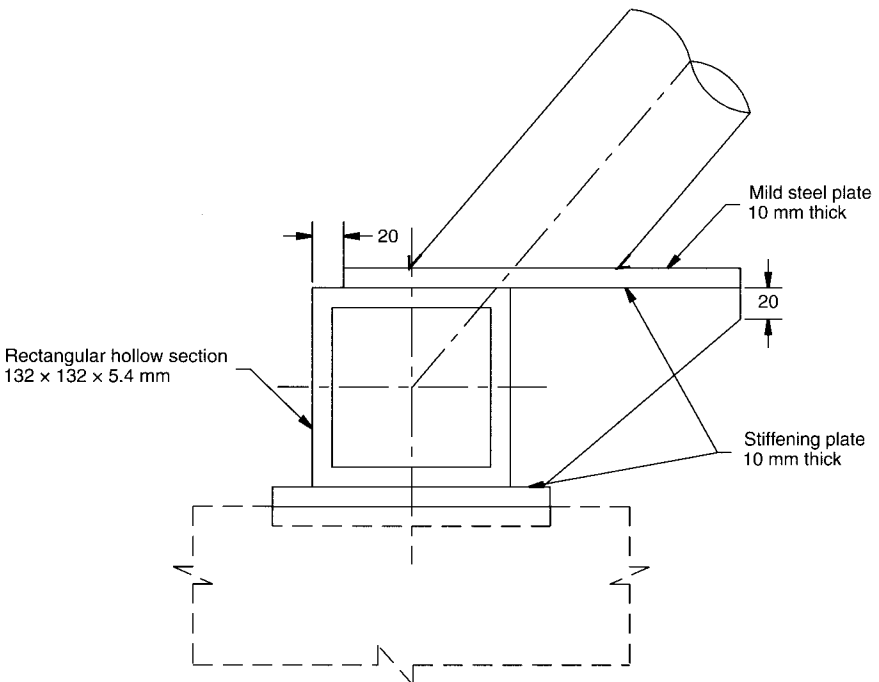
Detail of the connection of the edge beam and the barrel vault
